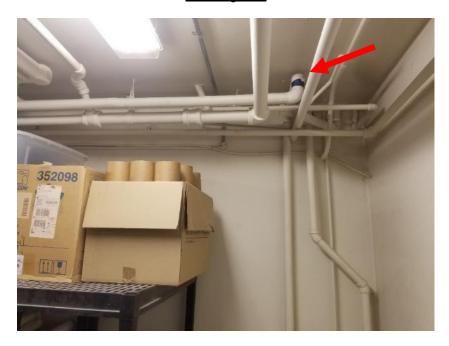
Basement, storage area, south-east corner, 1 poor condition fitting.
